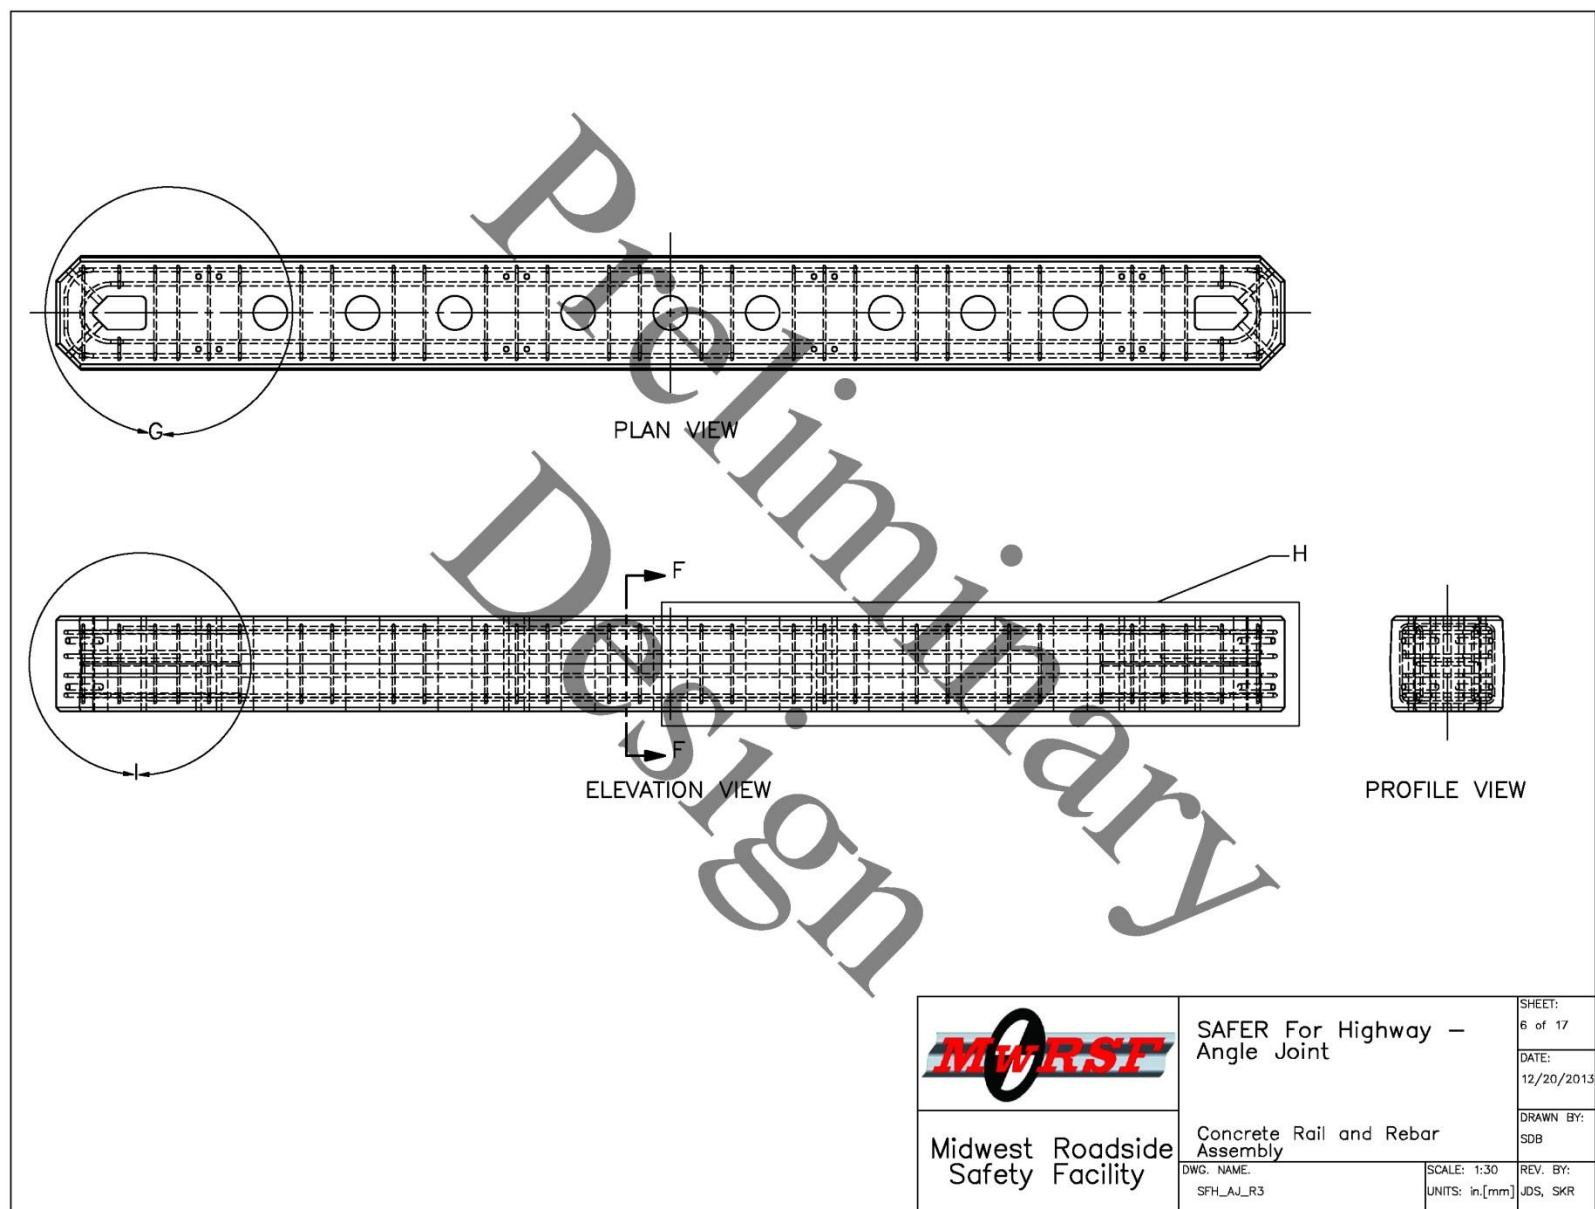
Preliminary Barrier Design, Concrete Rail and Rebar Assembly
